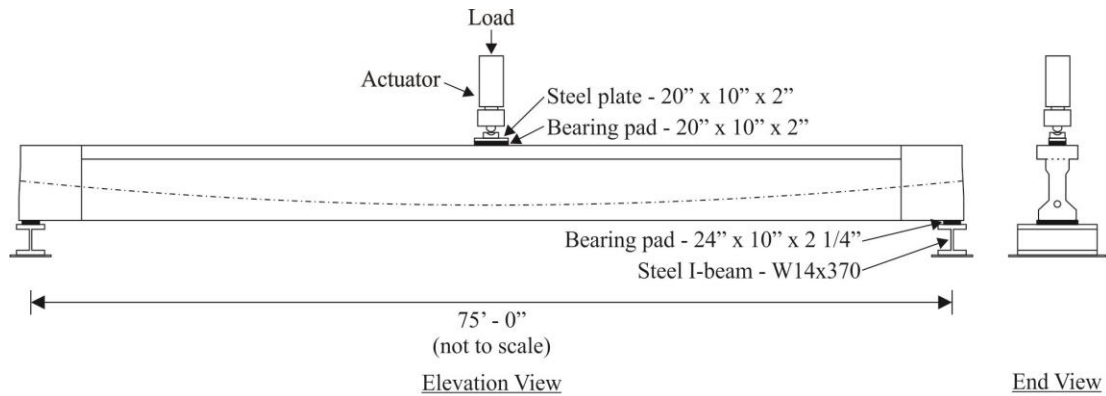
Flexural test setup: Beam specimens SS-1 and SS-2
